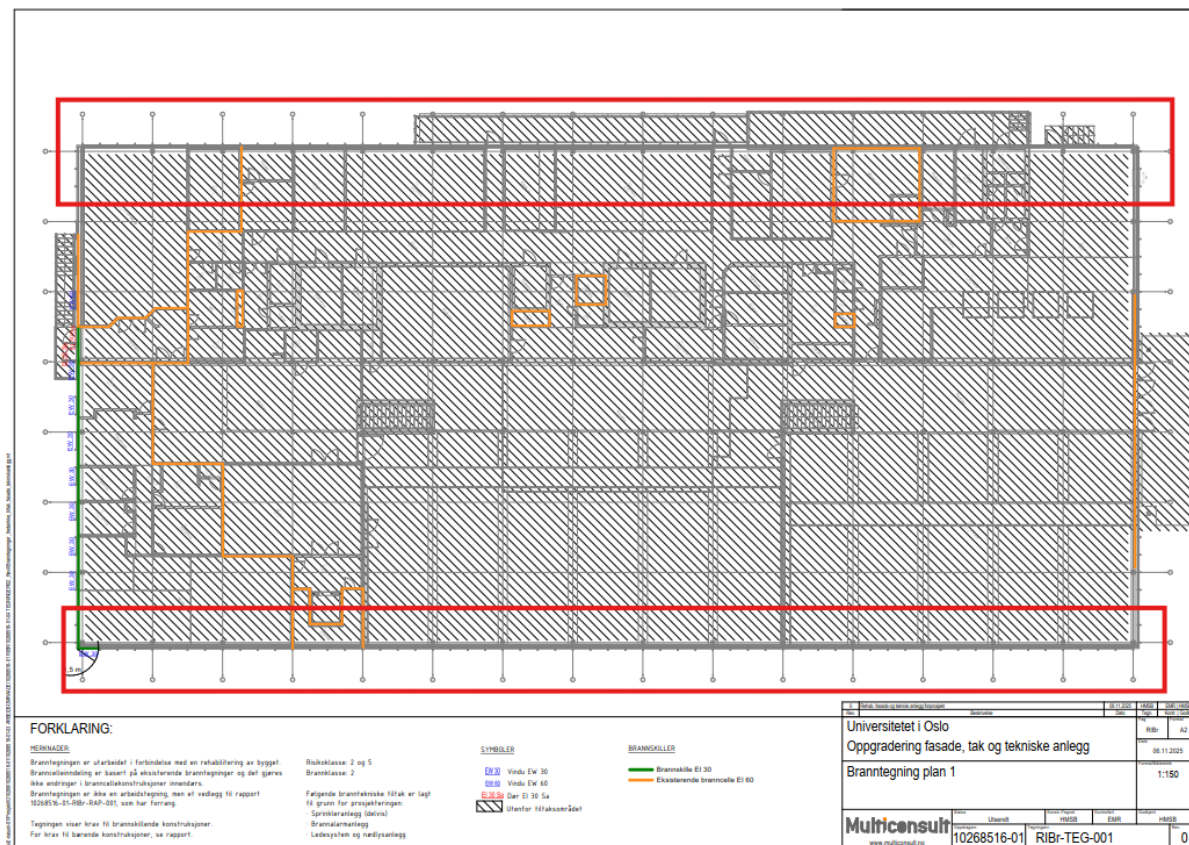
Façade areas under evaluation in RIBr drawing from Plan 1.
